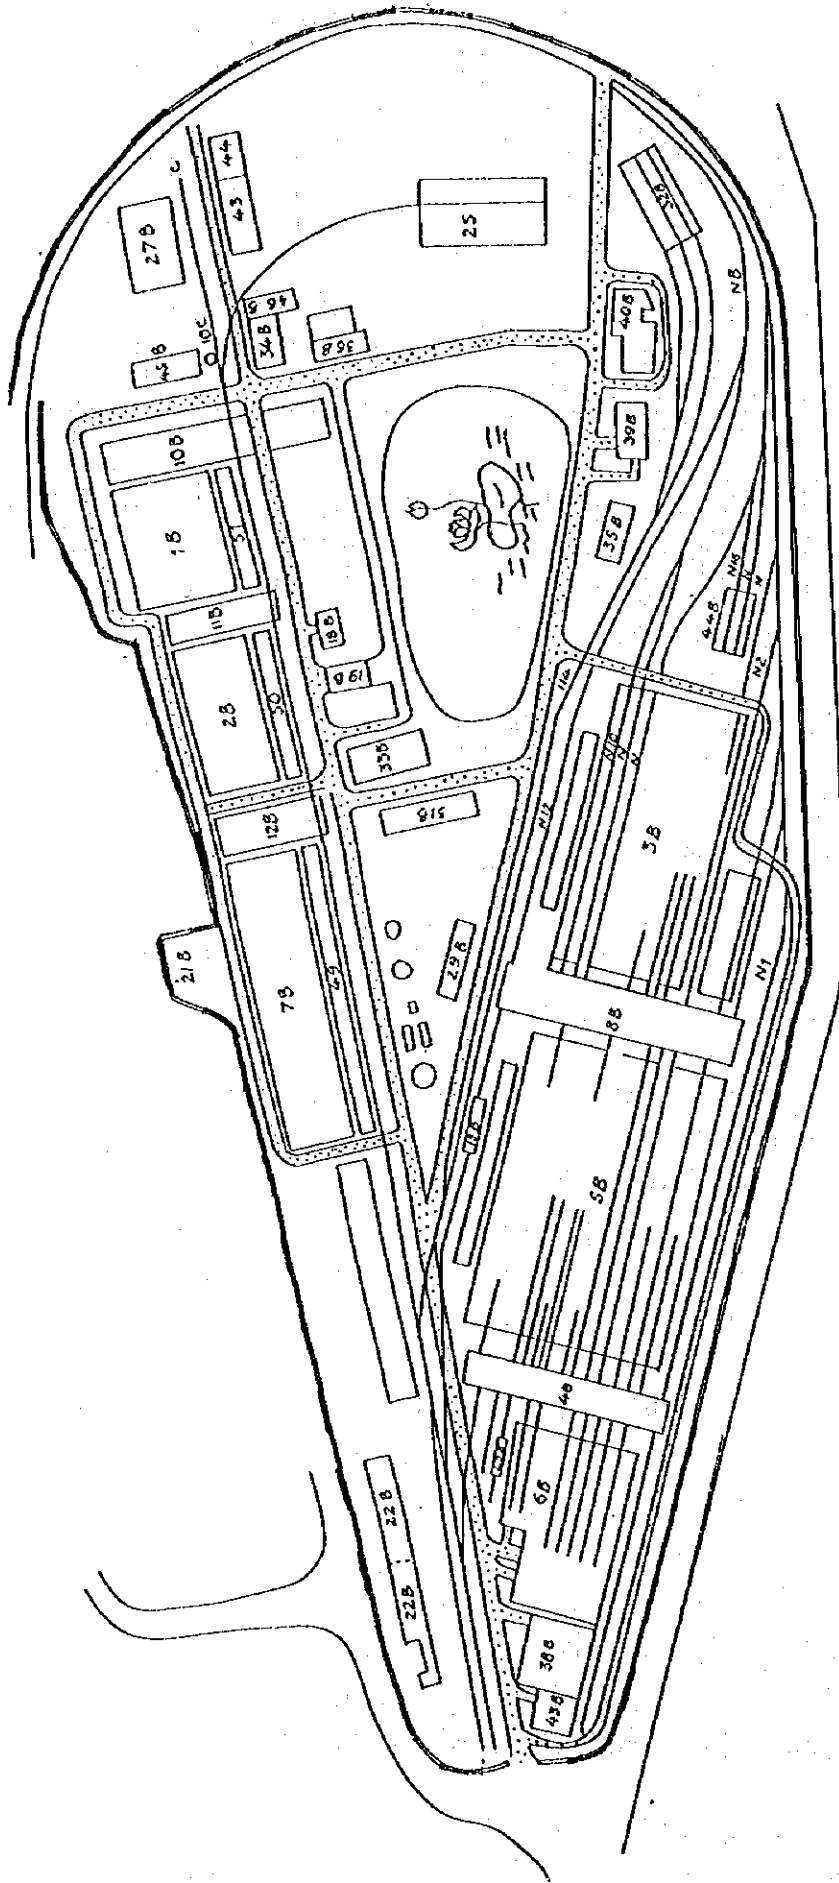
Layout Plan of Gialam Rolling Stock Factory
